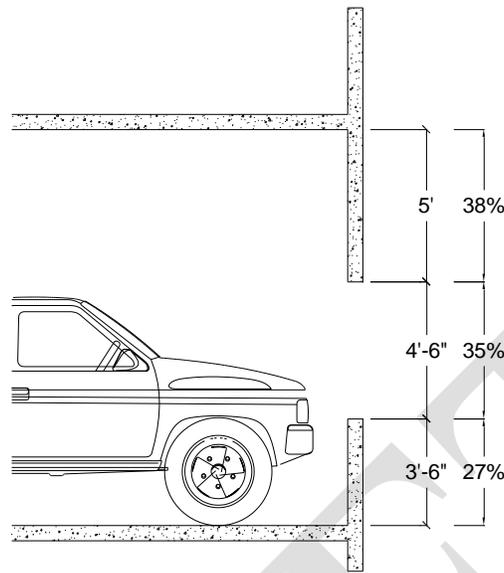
Cross-section of 35% Opening-to-Wall Height Ratio
